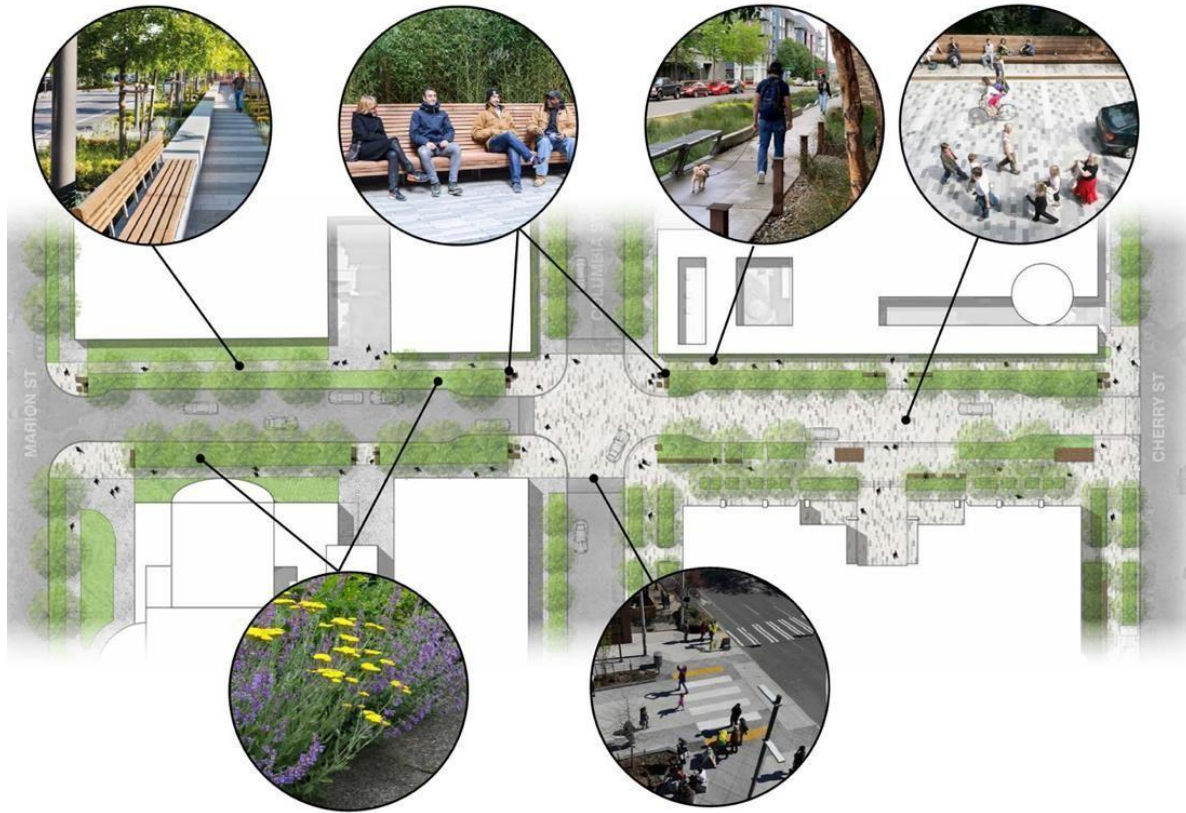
TERRY AVENUE STREET CONCEPT (FROM TERRY AVENUE VISION PLAN)
